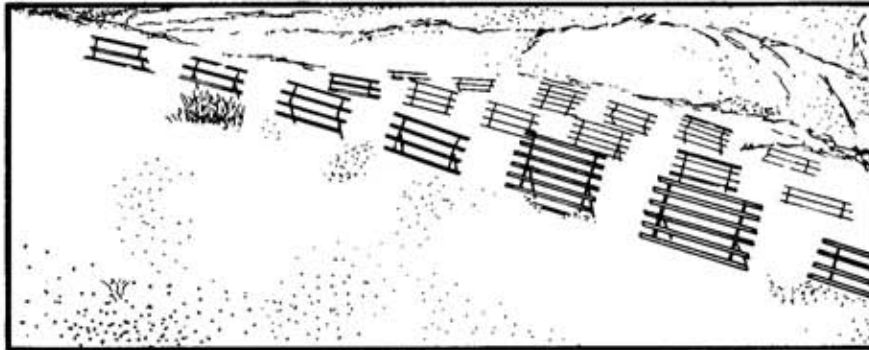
A typical arrangement of structures on slopes in the Alps.
